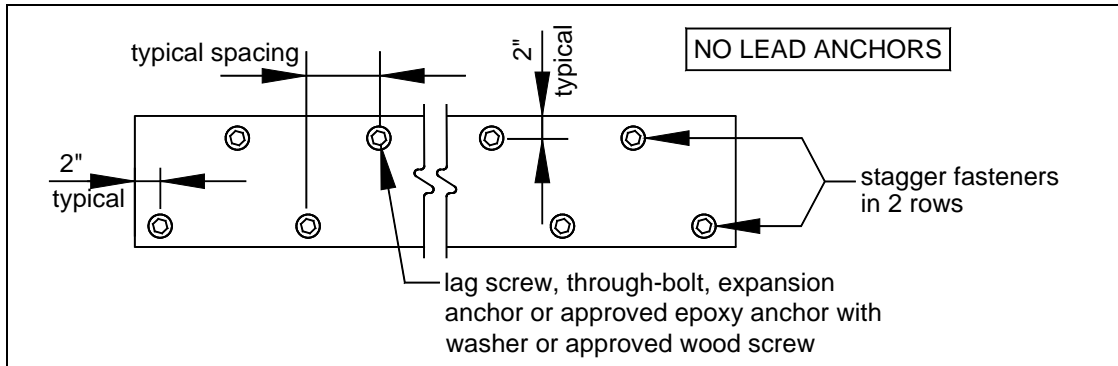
LEDGER BOARD FASTENER SPACING AND CLEARANCES
